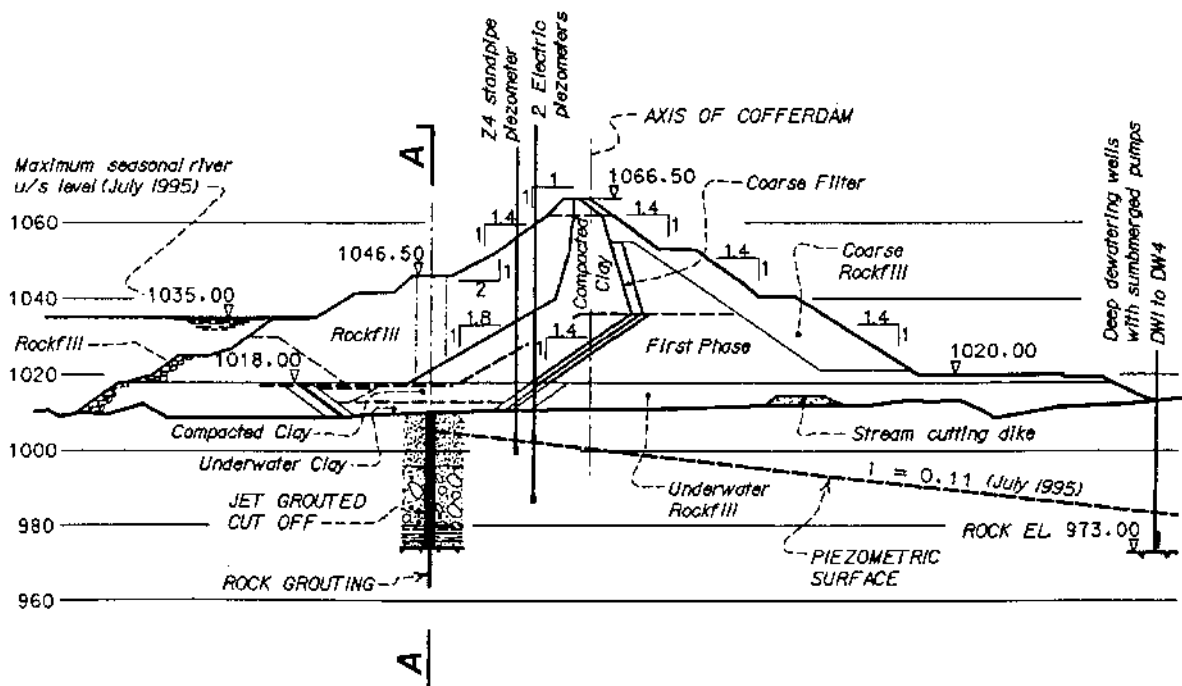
Cross-section B-B of upstream cofferdam and foundation, showing underwater clay zone, connection of dam core to jet-grouted cutoff and stream cutting rockfill dyke.
